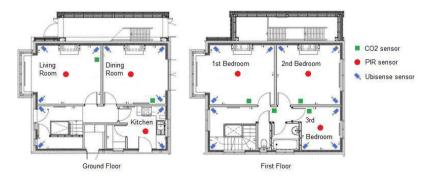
Floor plans of the house with CO₂, PIR and Ubisense sensors
